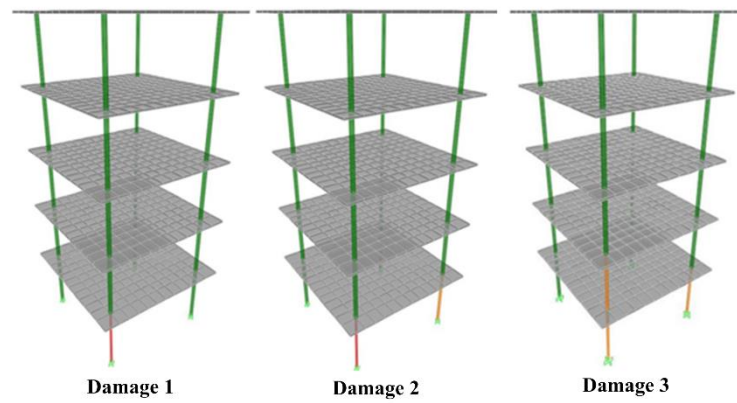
Modifiable steel frame damage scenarios
